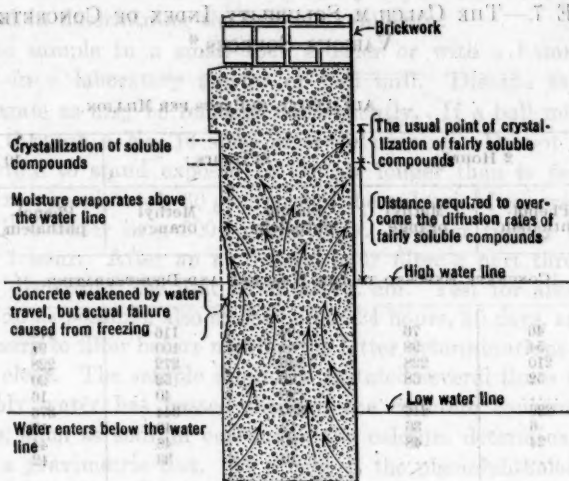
WATER TRAVEL IN CONCRETE WALL PARTLY SUBMERGED.
